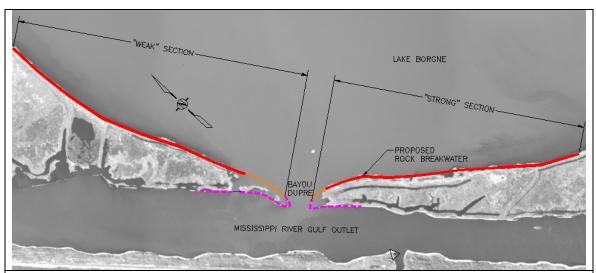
(NTS) – "Weak" and "Strong" Soil Settlement Sections at Bayou Dupre Section
